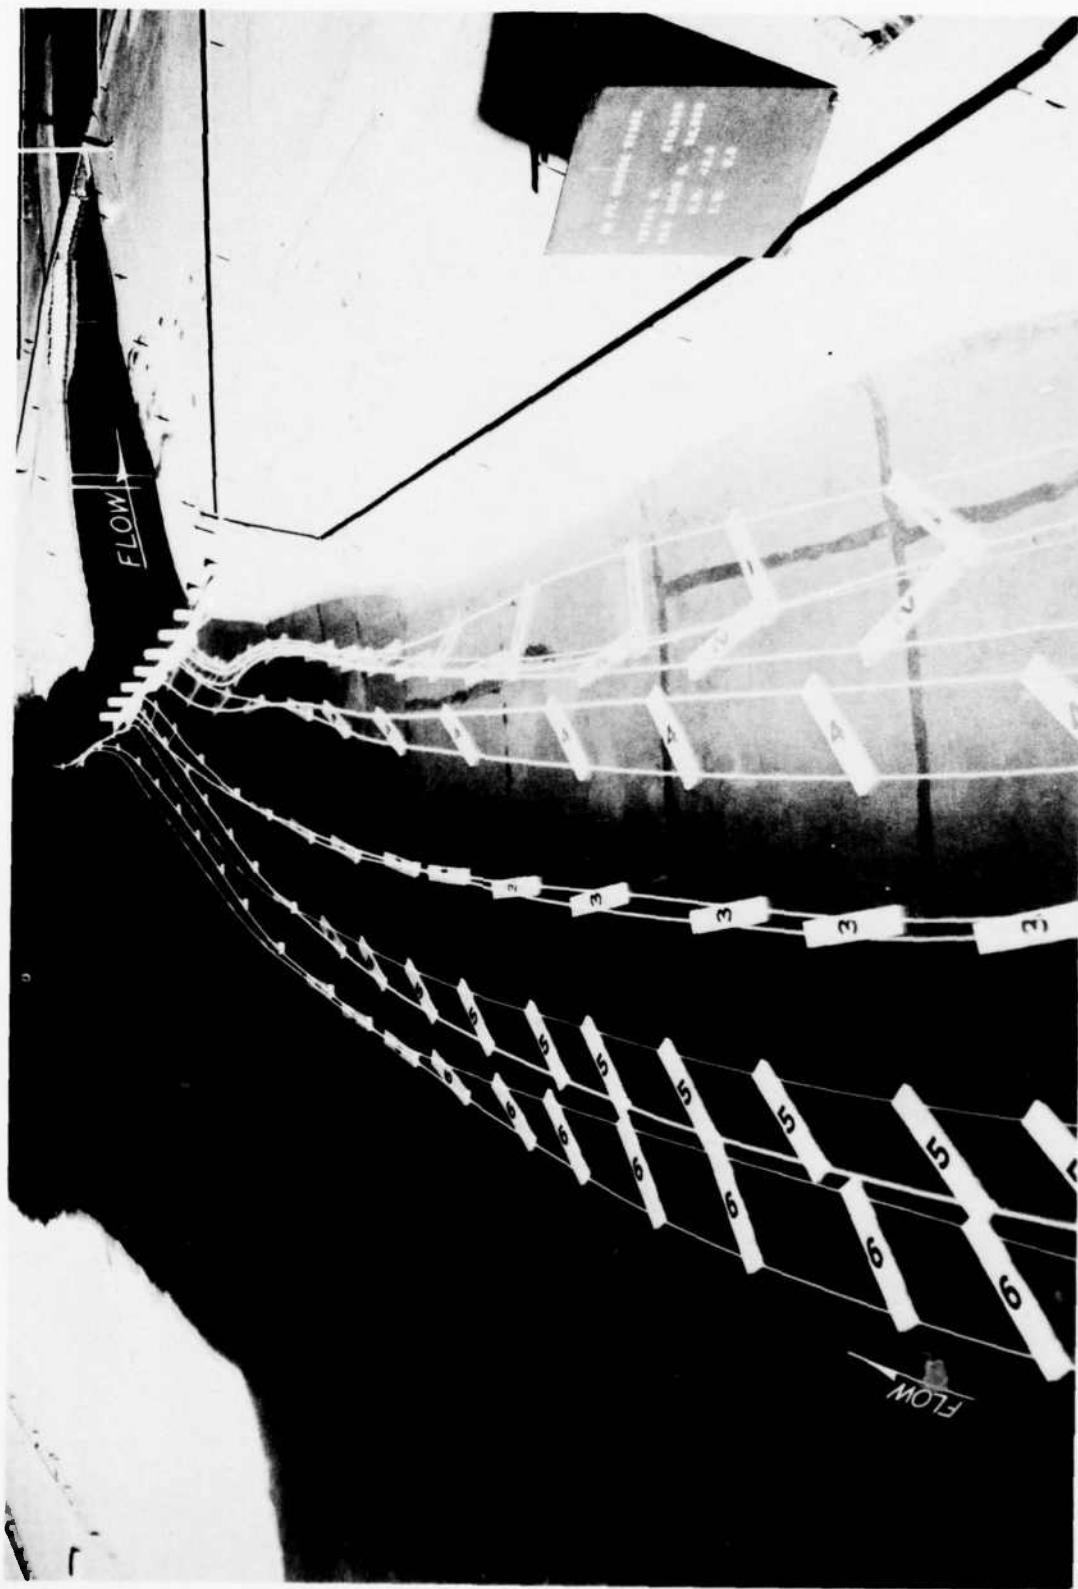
Pier-supported floating barge barrier, 16-ft stage
